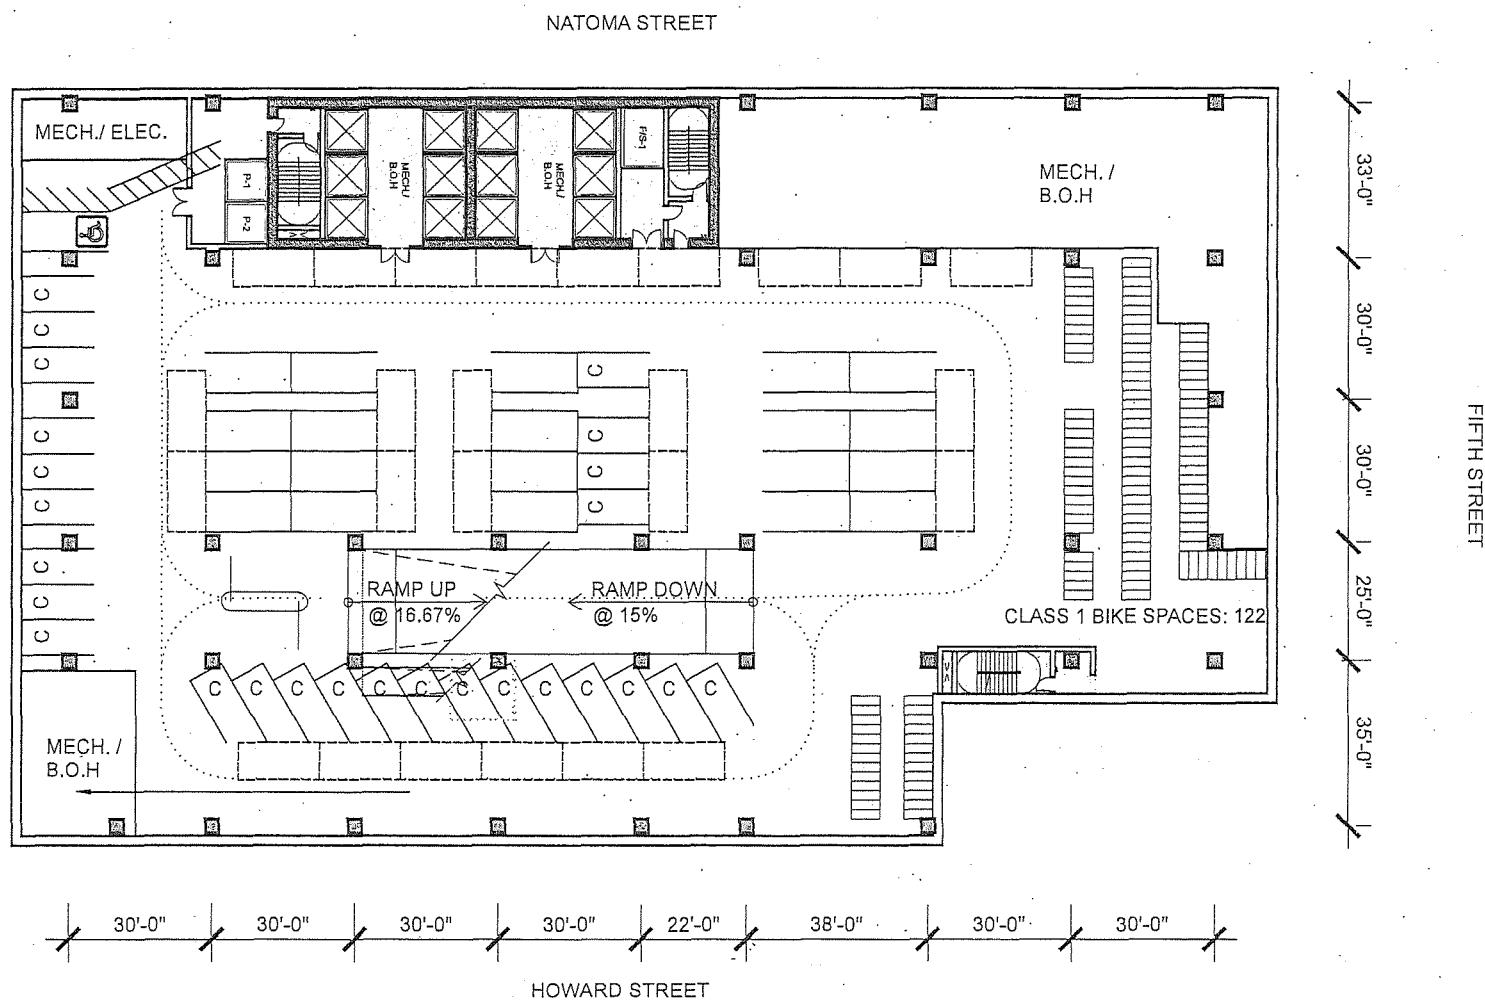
B: TYPICAL PLANS H1 BUILDING
